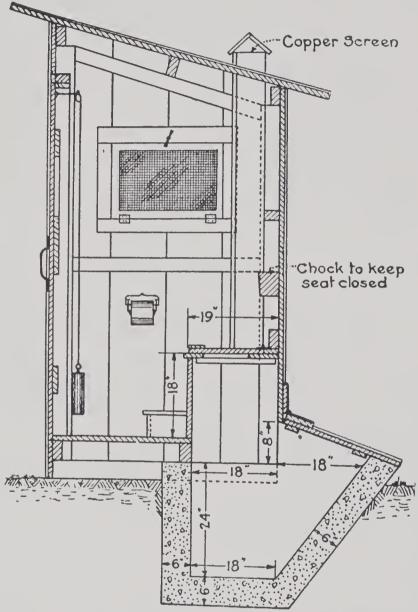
Sketch of concrete vault privy. (Courtesy, George L. Hall, Maryland Department of Health.)
